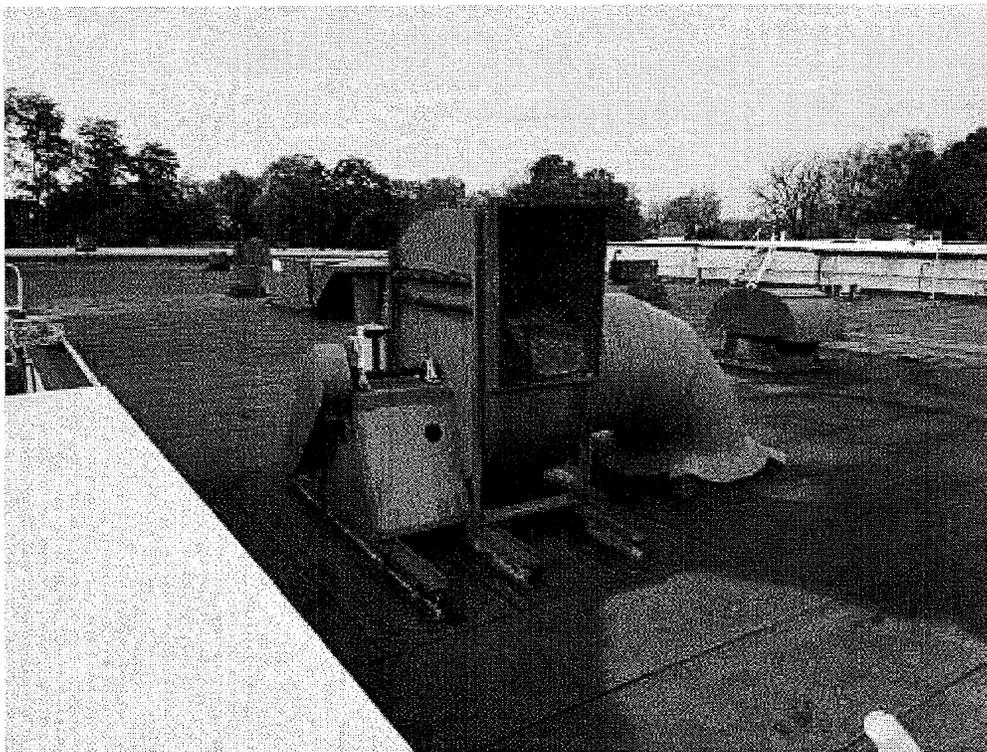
(Roof Exhaust) : Roof exhaust from etch tank line
